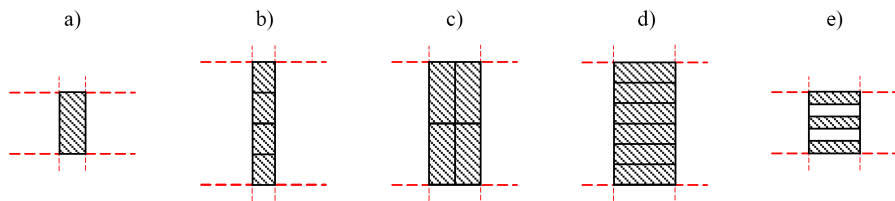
Various types of elements (basic units) in parallel systems: a) structural timber; b) stacked structural timber; c) multi-girder; d) glued laminated (solid) timber; e) basic element of cross laminated timber
